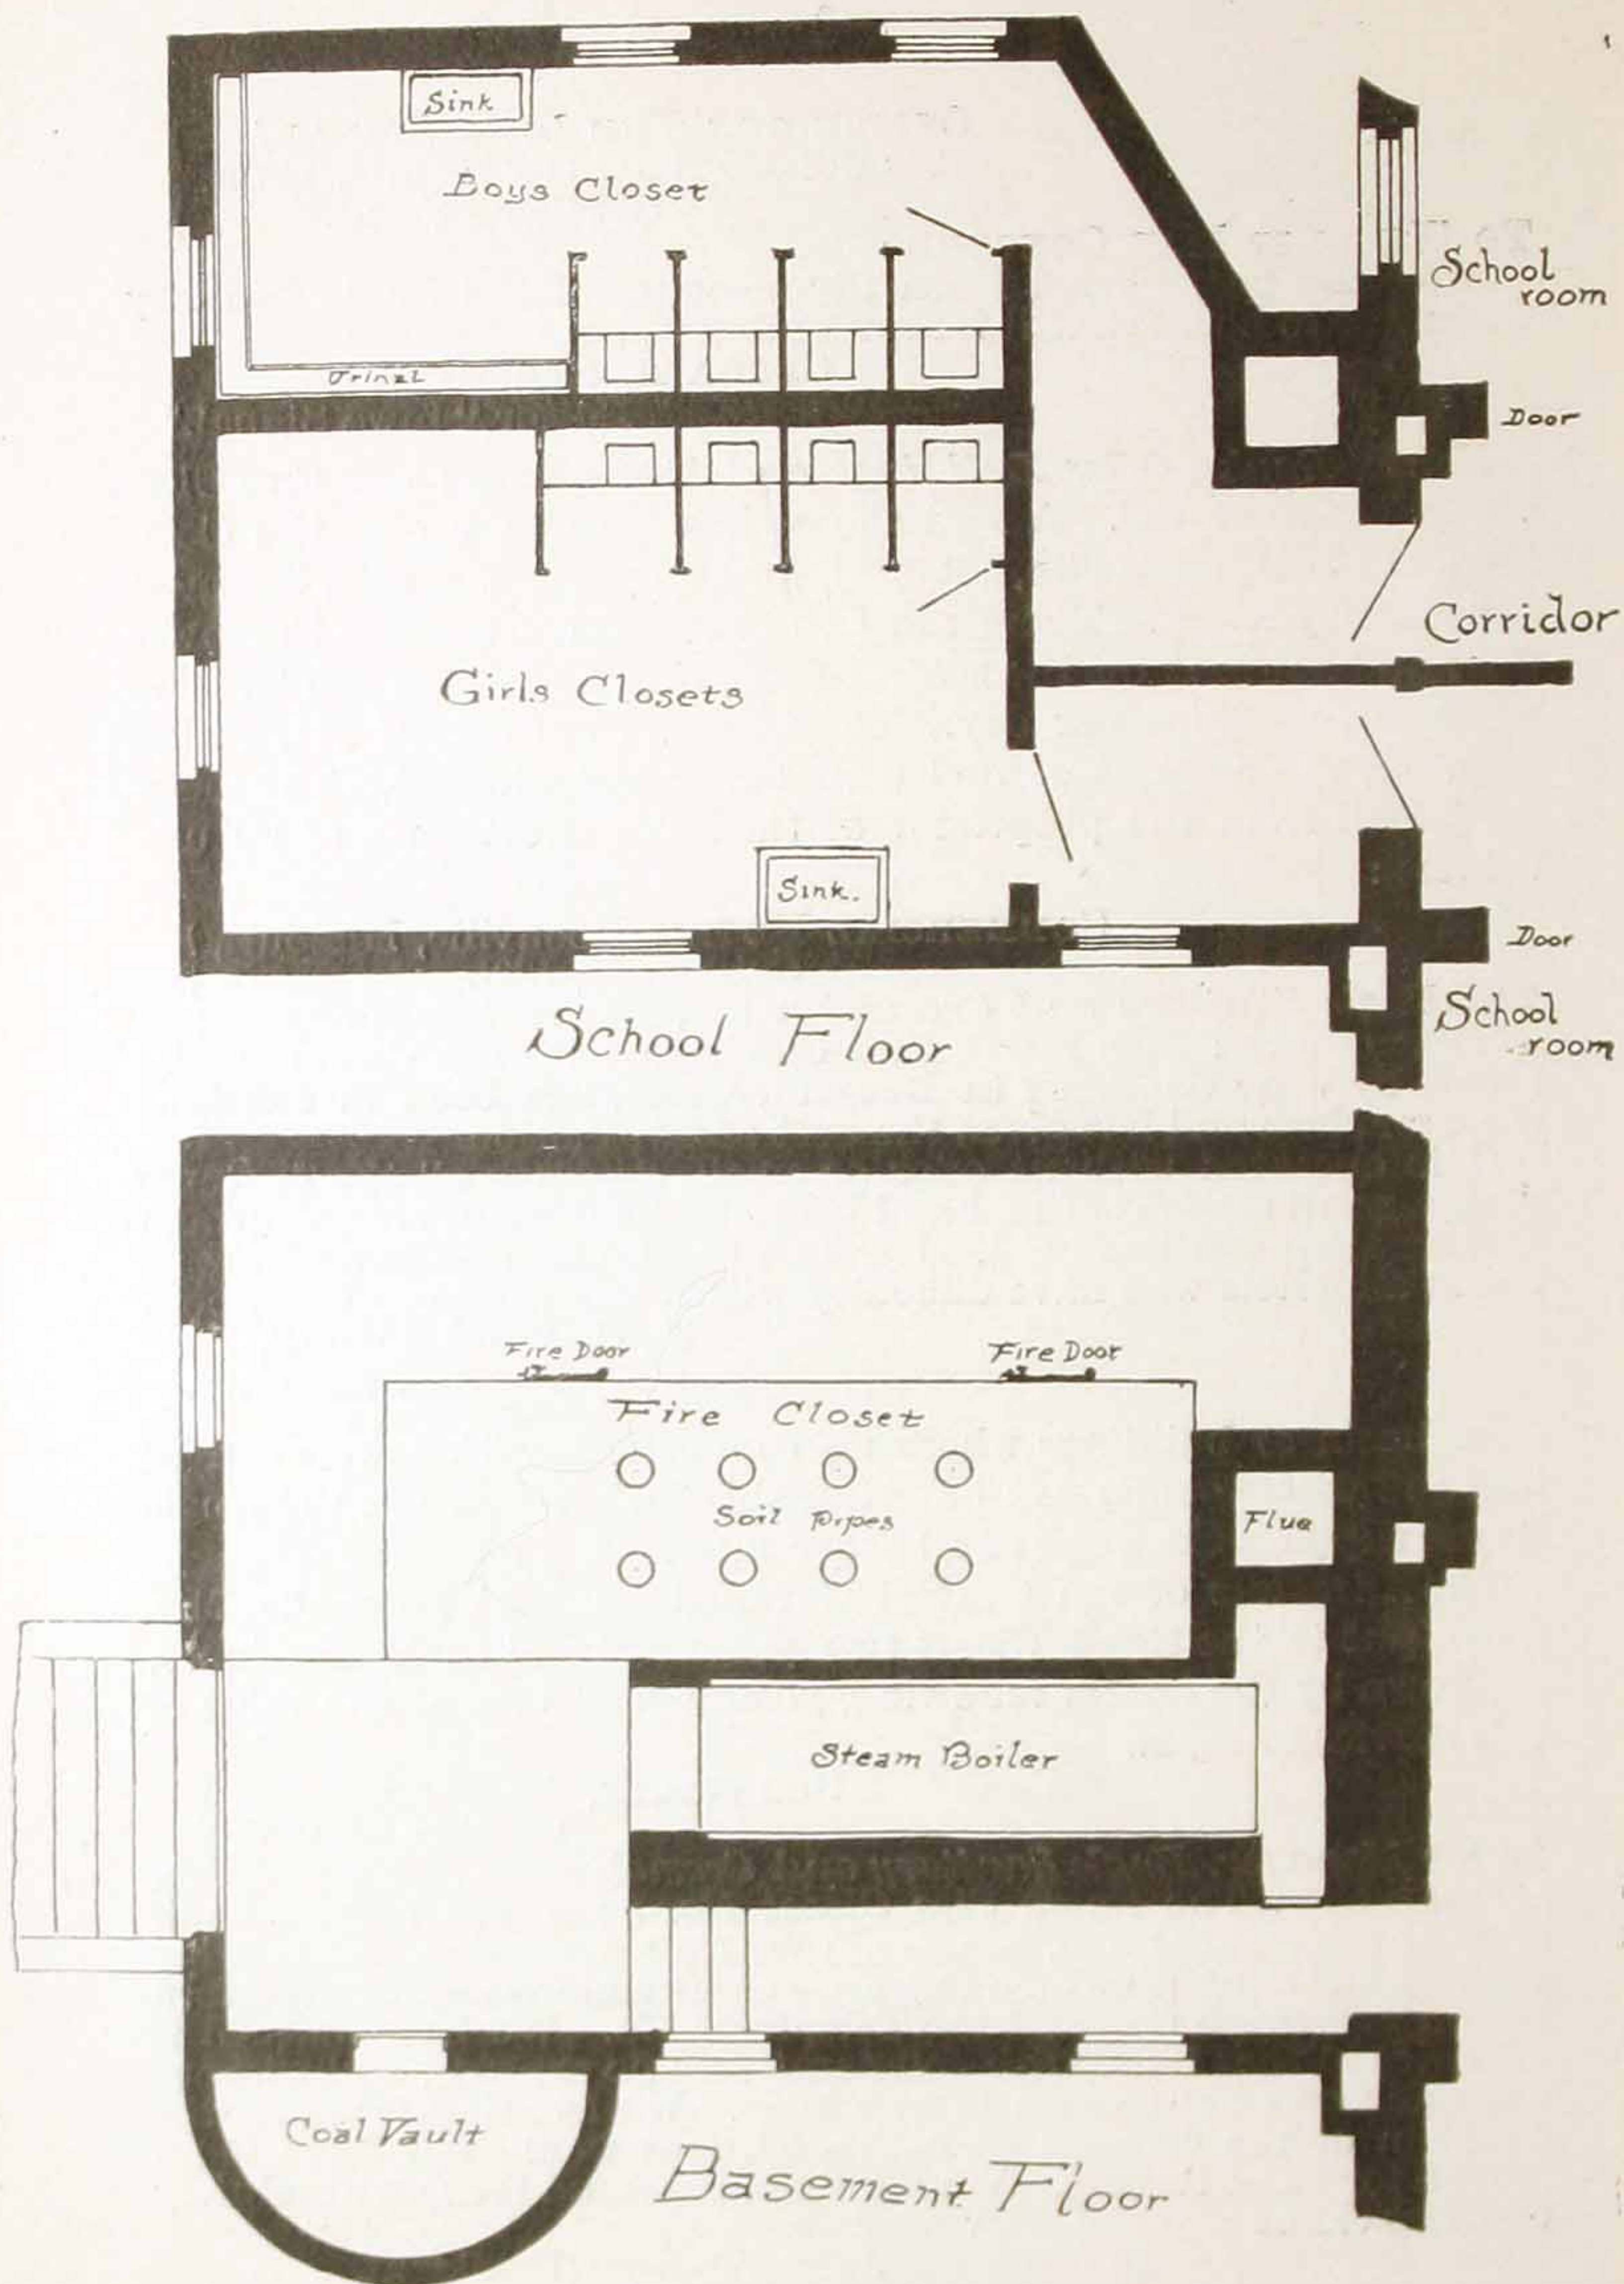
BASEMENT, FLOOR PLAN OF ANNEX TO SCHOOL BUILDING
